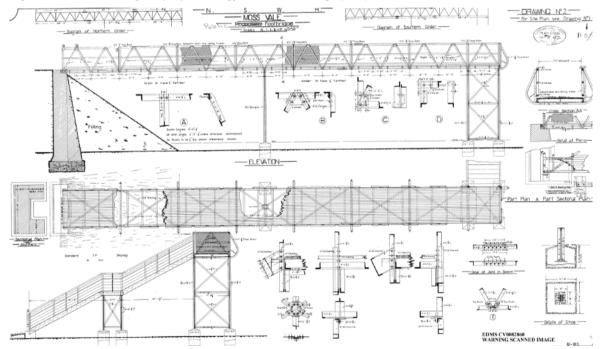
1915 drawings of proposed Lackey Road footbridge (VPR)
